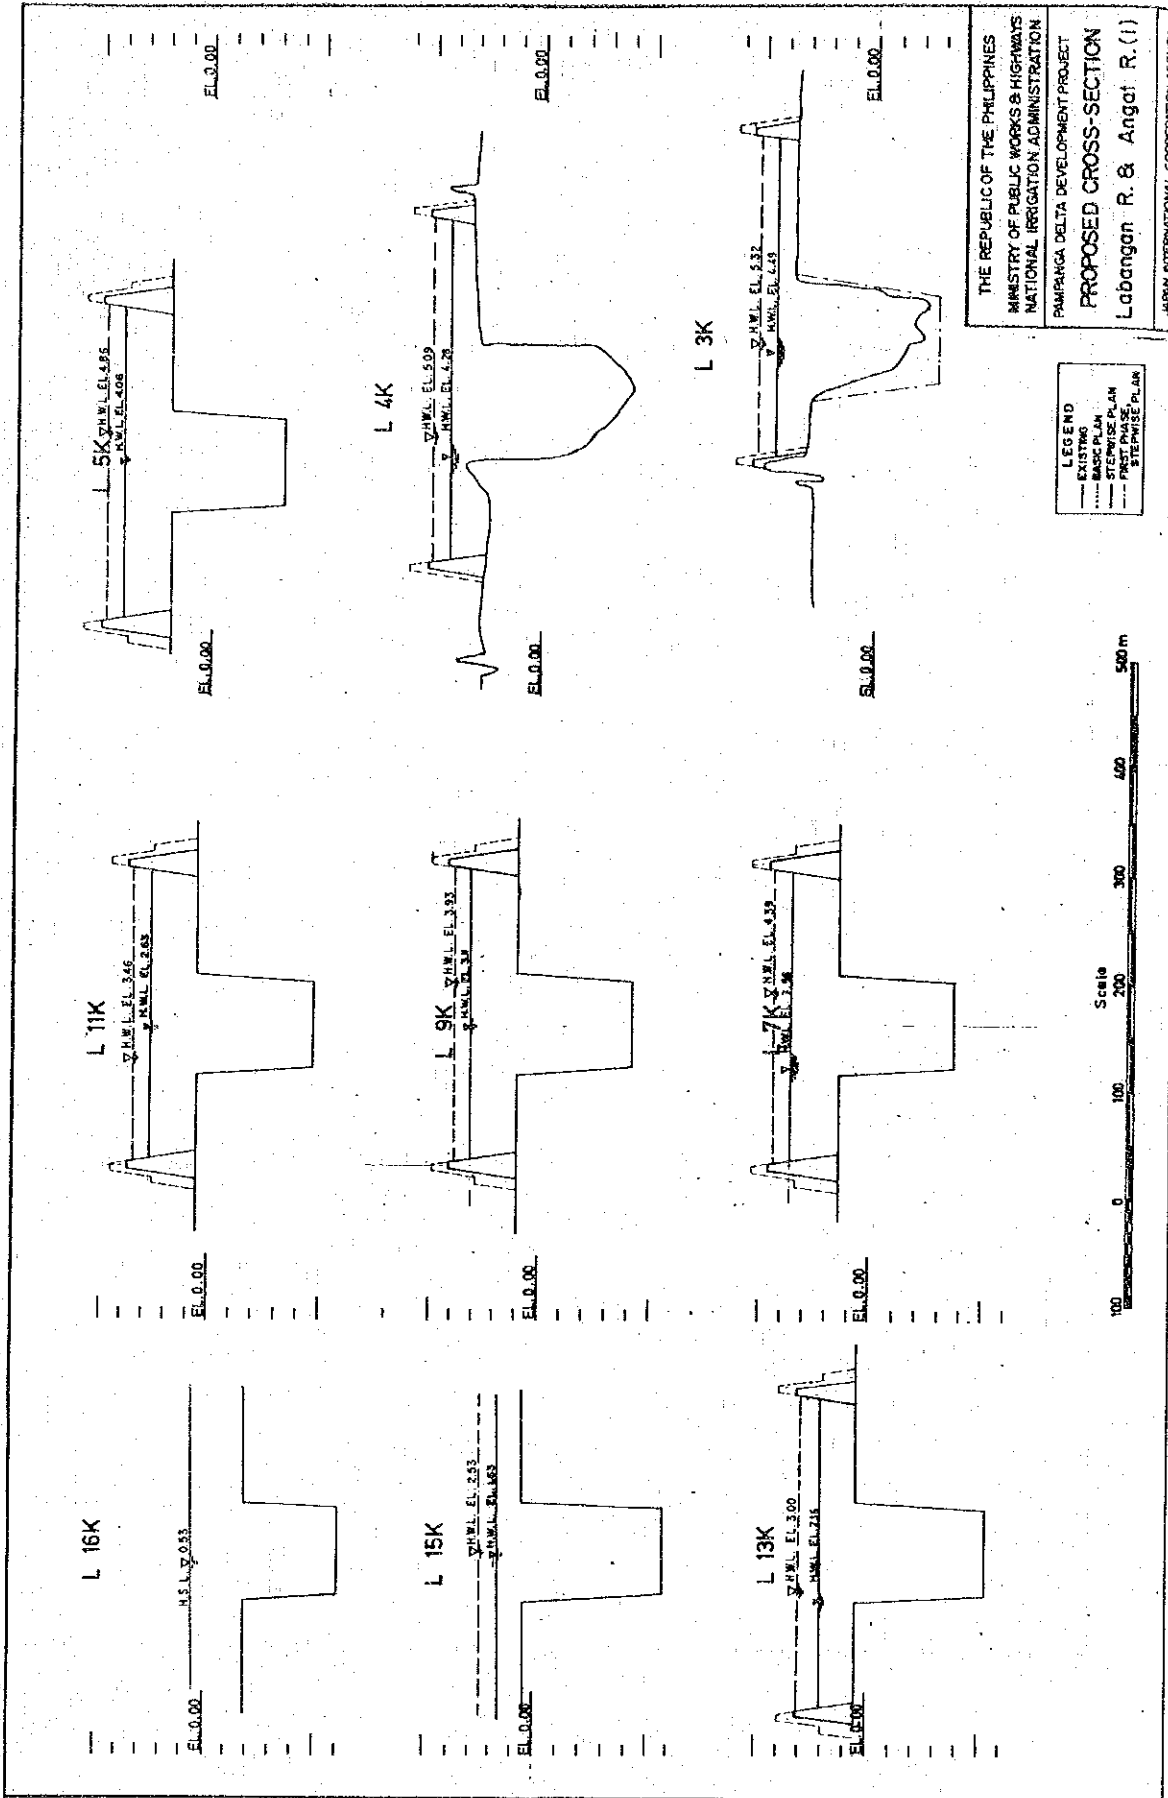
(14) PROPOSED CHANNEL CROSS-SECTION
